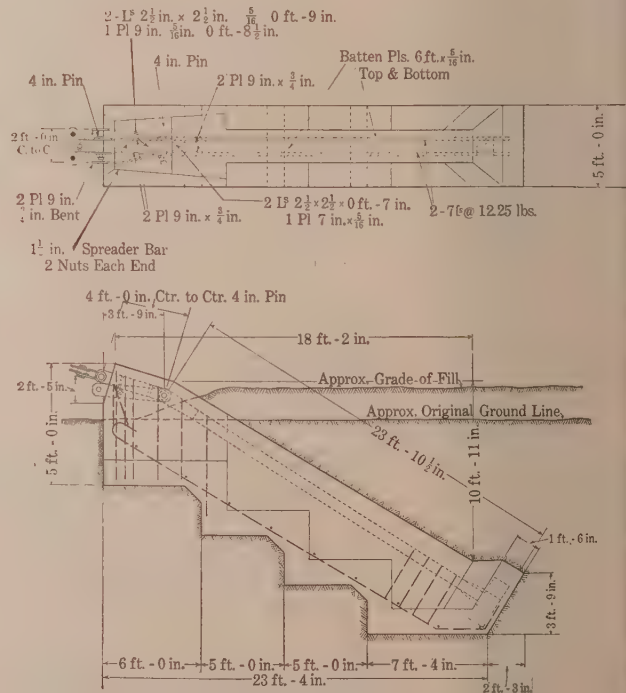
PLAN AND ELEVATION OF ANCHOR
